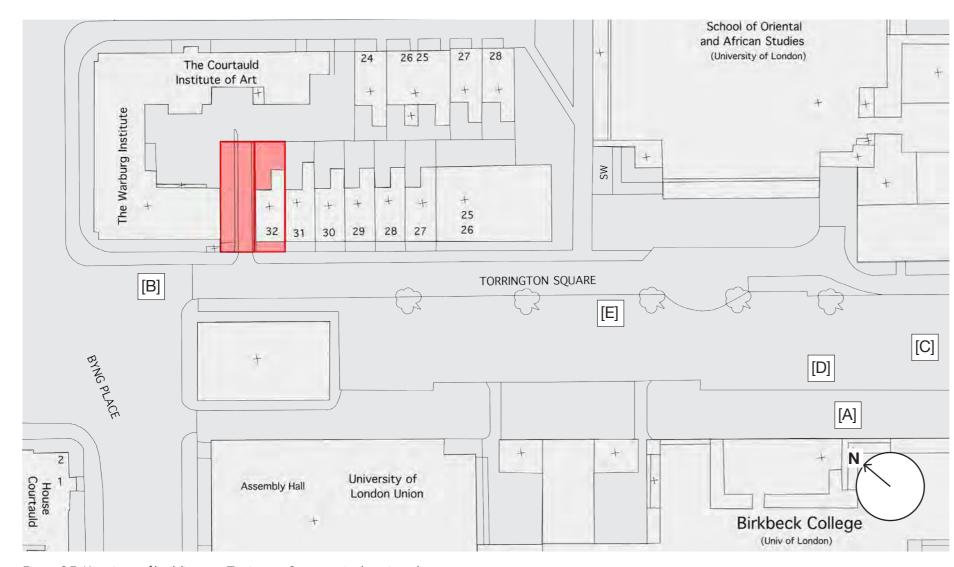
Key views of buildings on Torrington Square - site location plan
